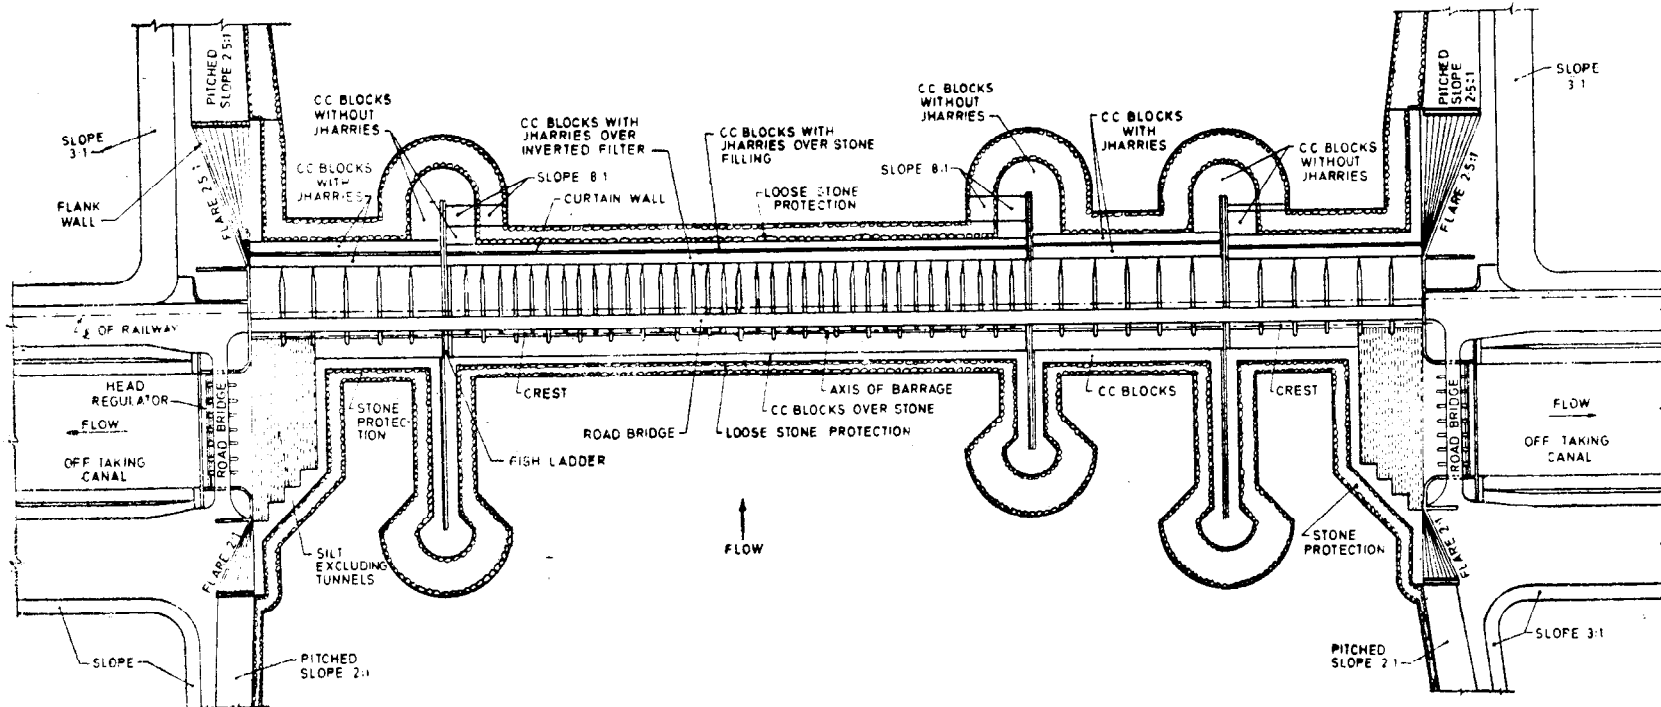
TYPICAL LAYOUT OF A BARRAGE
